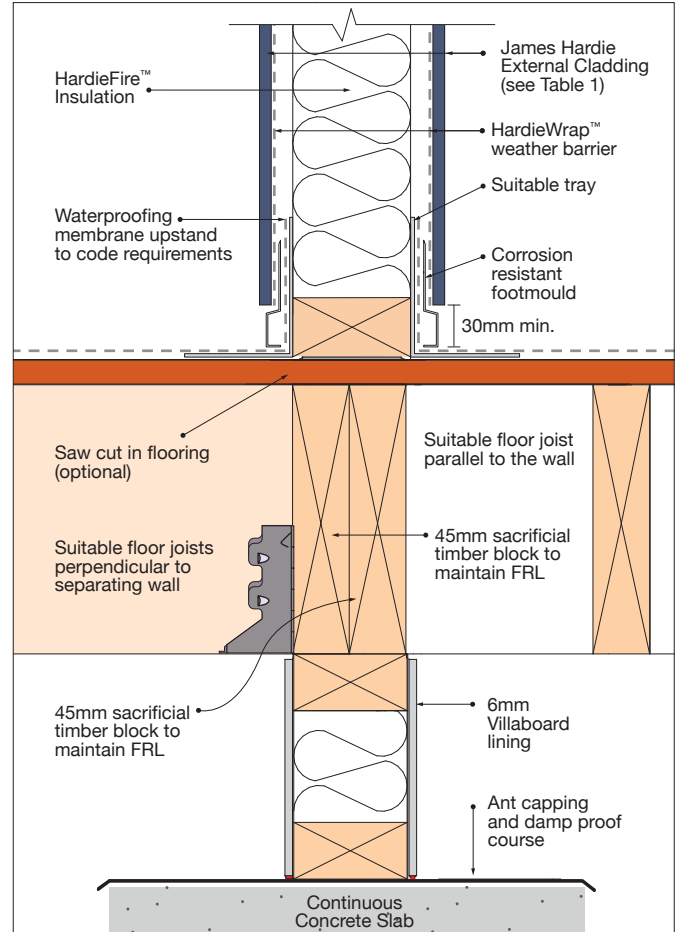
HARDIESMART™ BLADE WALL TO SUSPENDED GROUND FLOOR DECK
